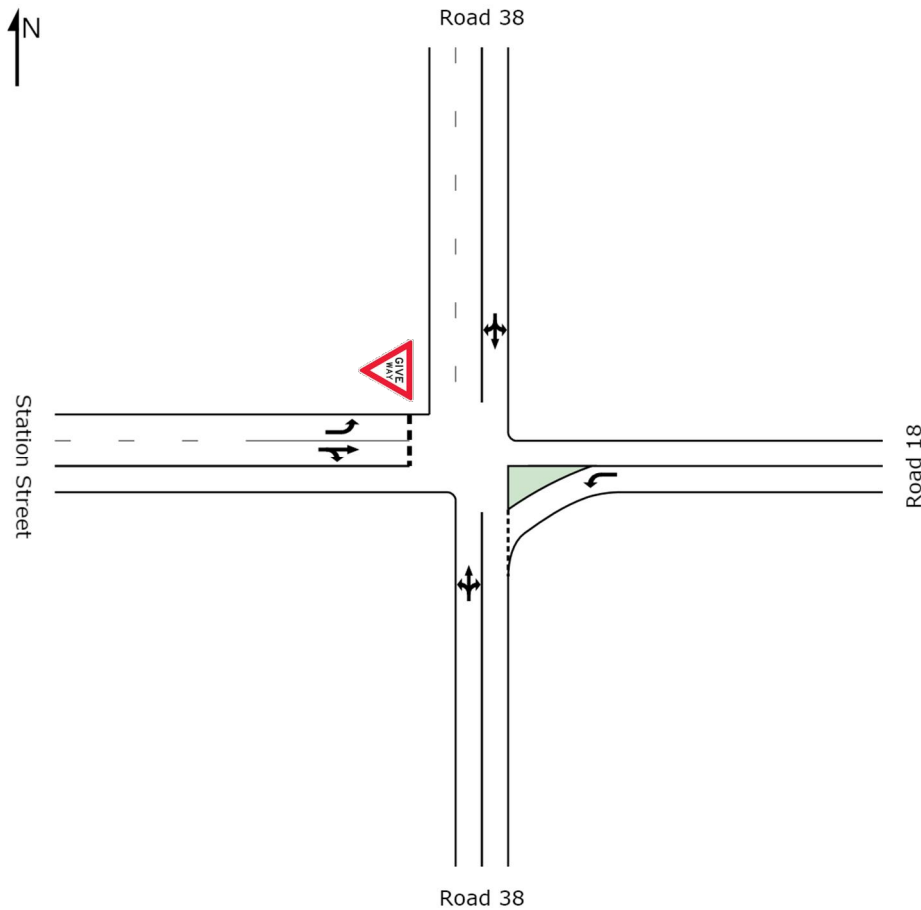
Proposed layout of intersection of Road 38 and Station Street
